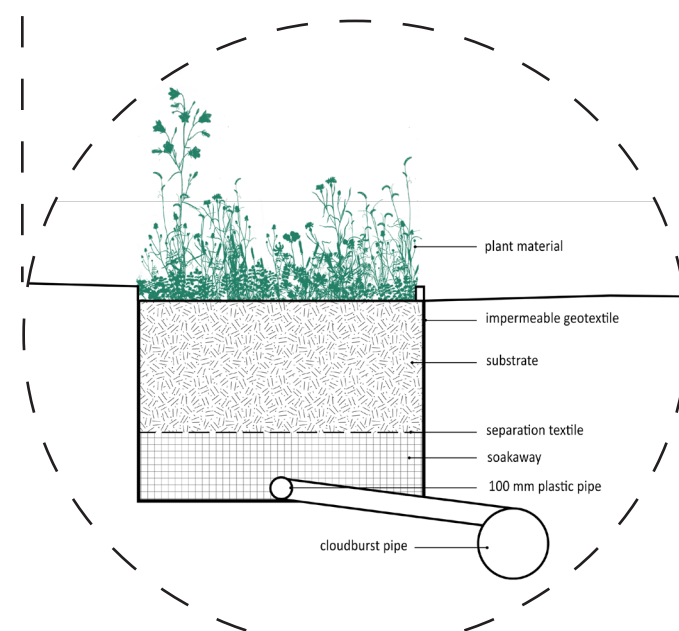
detail on a BGI component and its connection to cloudburst pipe
